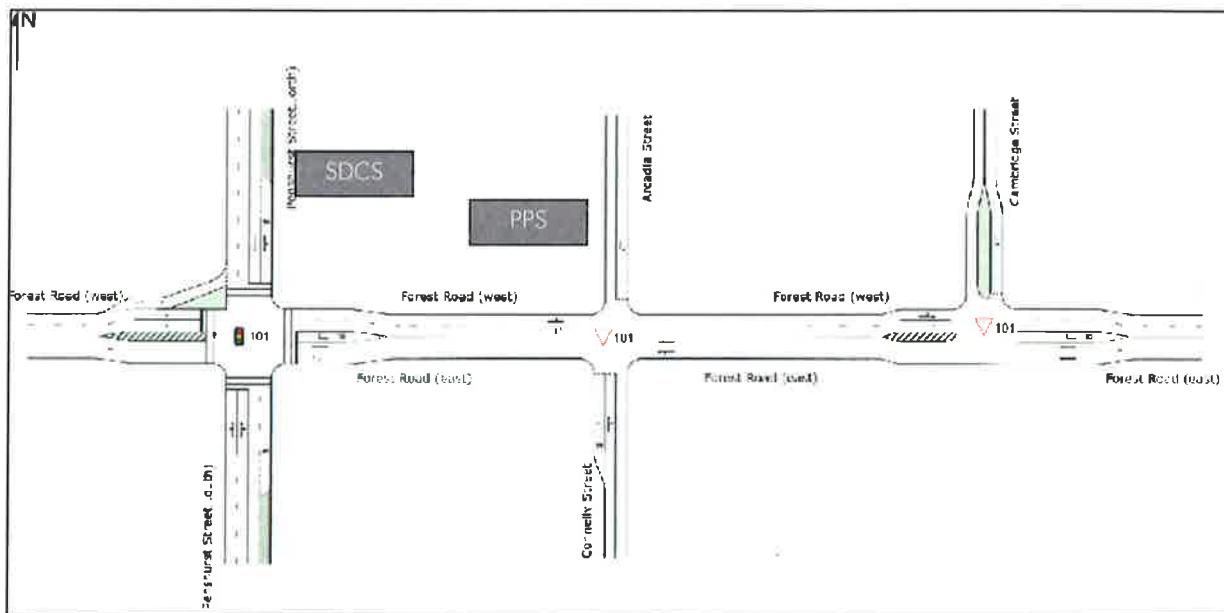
| Local road network intersections analysed (Source: Applicant's RtS 2018).
